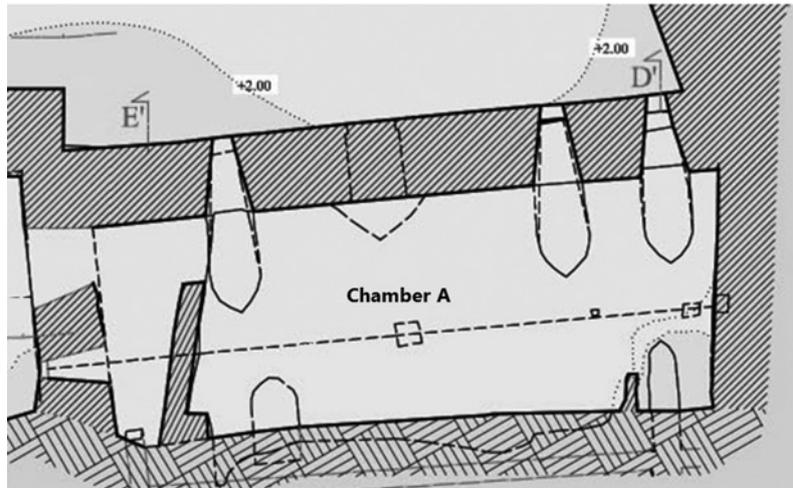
Plan showing the main vault of ground floor level.
